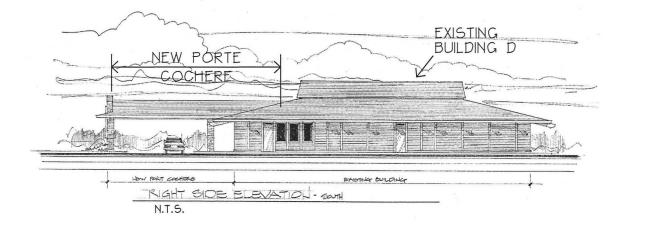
SANCTUARY ELEVATIONS + SIGNS NEVADA CITY ENGINEERING , INC.
